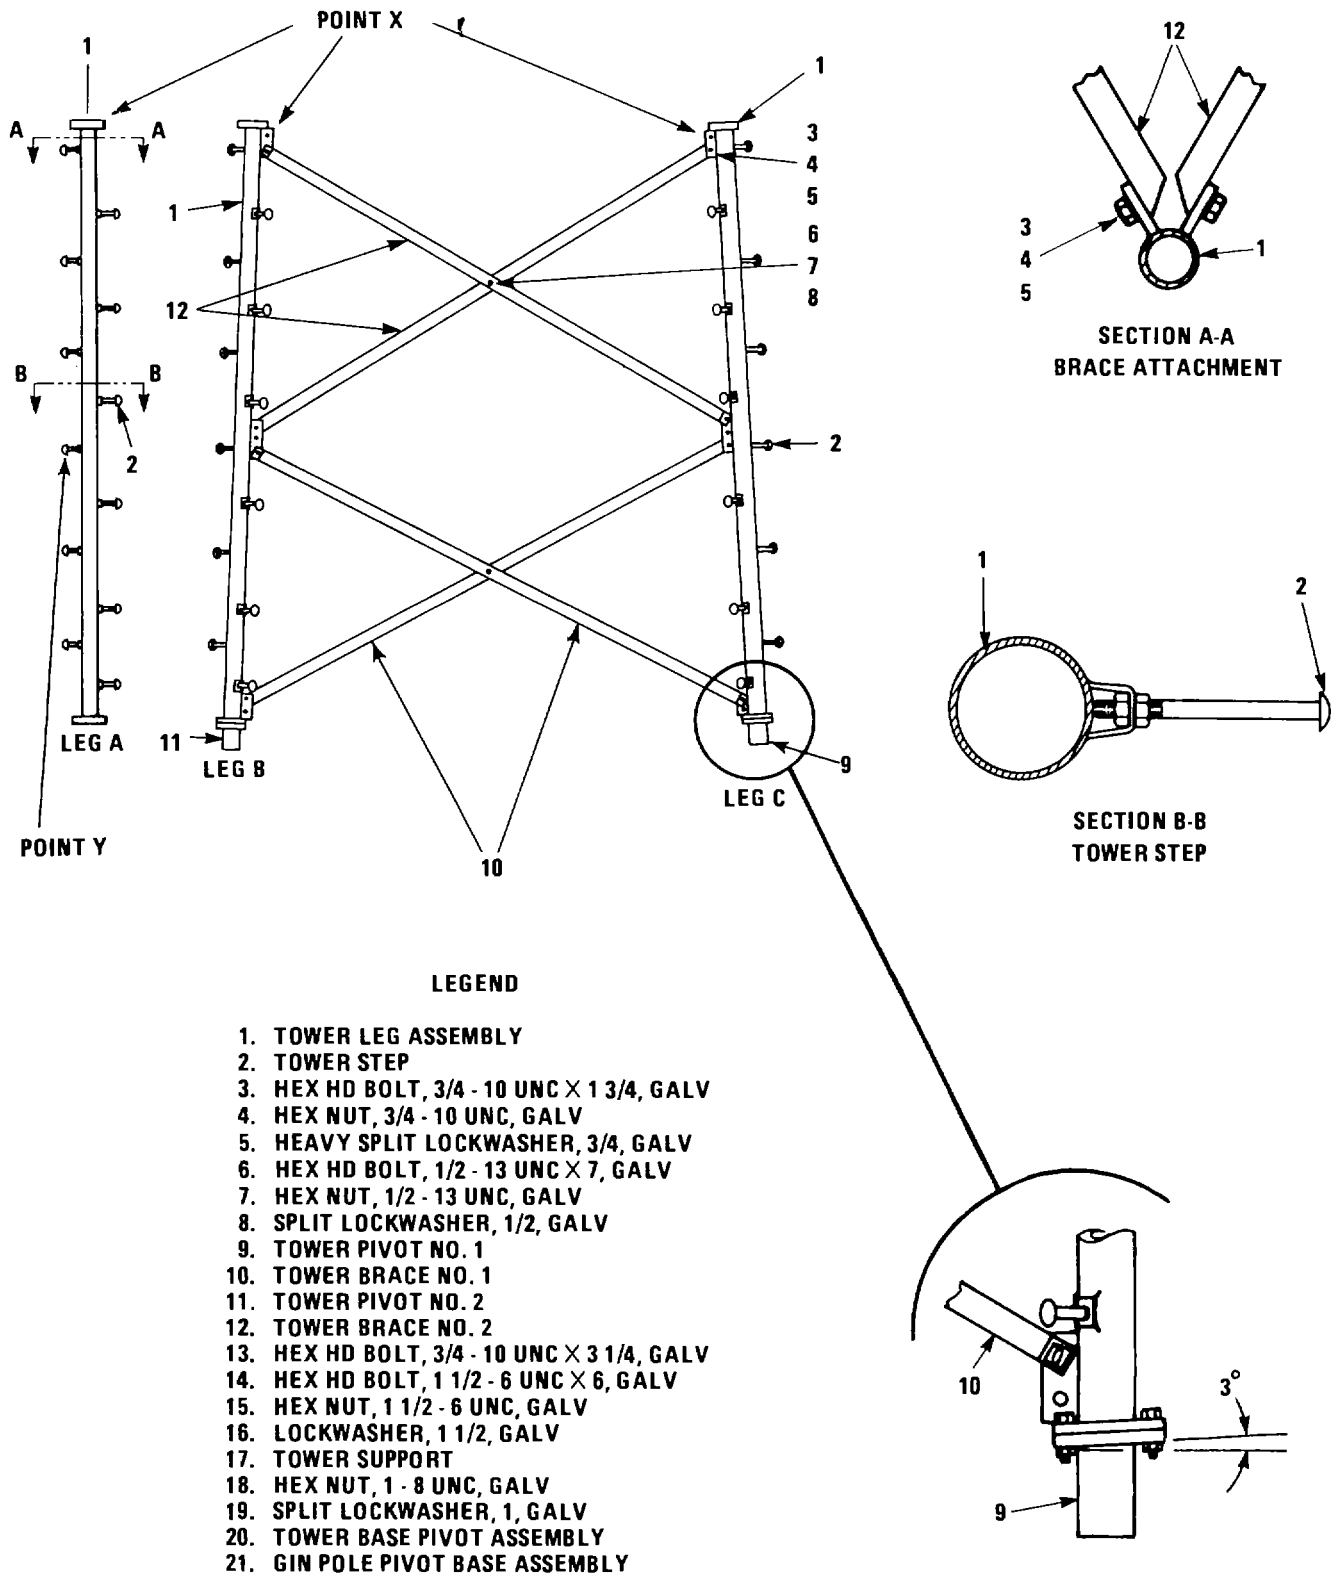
Tower Section No. 1 Installation (Sheet 1 of 2)
